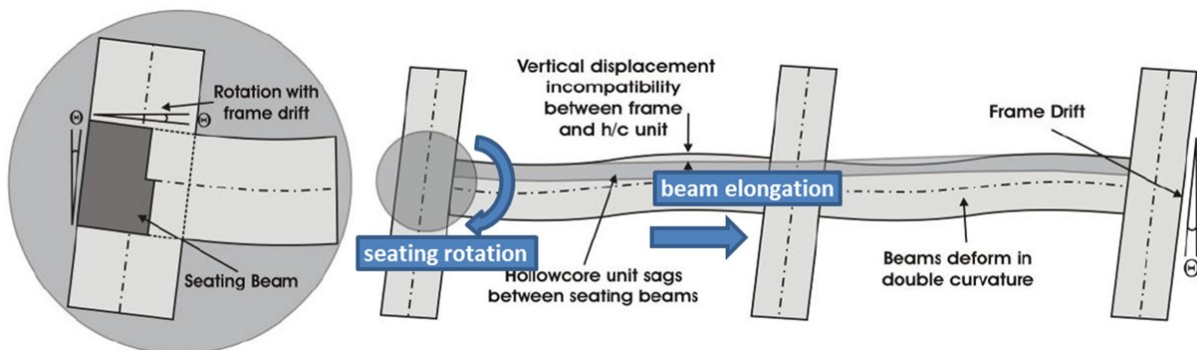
Beam elongation and relative rotation between floor units and support (Courtesy of: Elwood, 2018).
